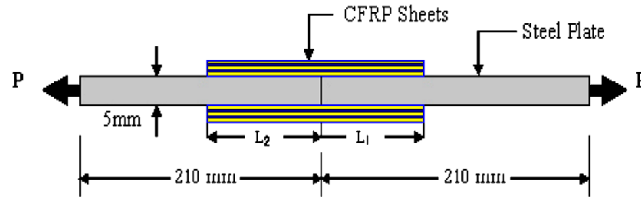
Schematic view of double strap joints between CFRP and plates (not to scale)
